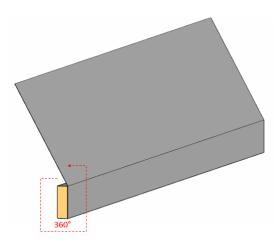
3D sketch showing the wrapping of the roof tarpaulin to the wooden beam
